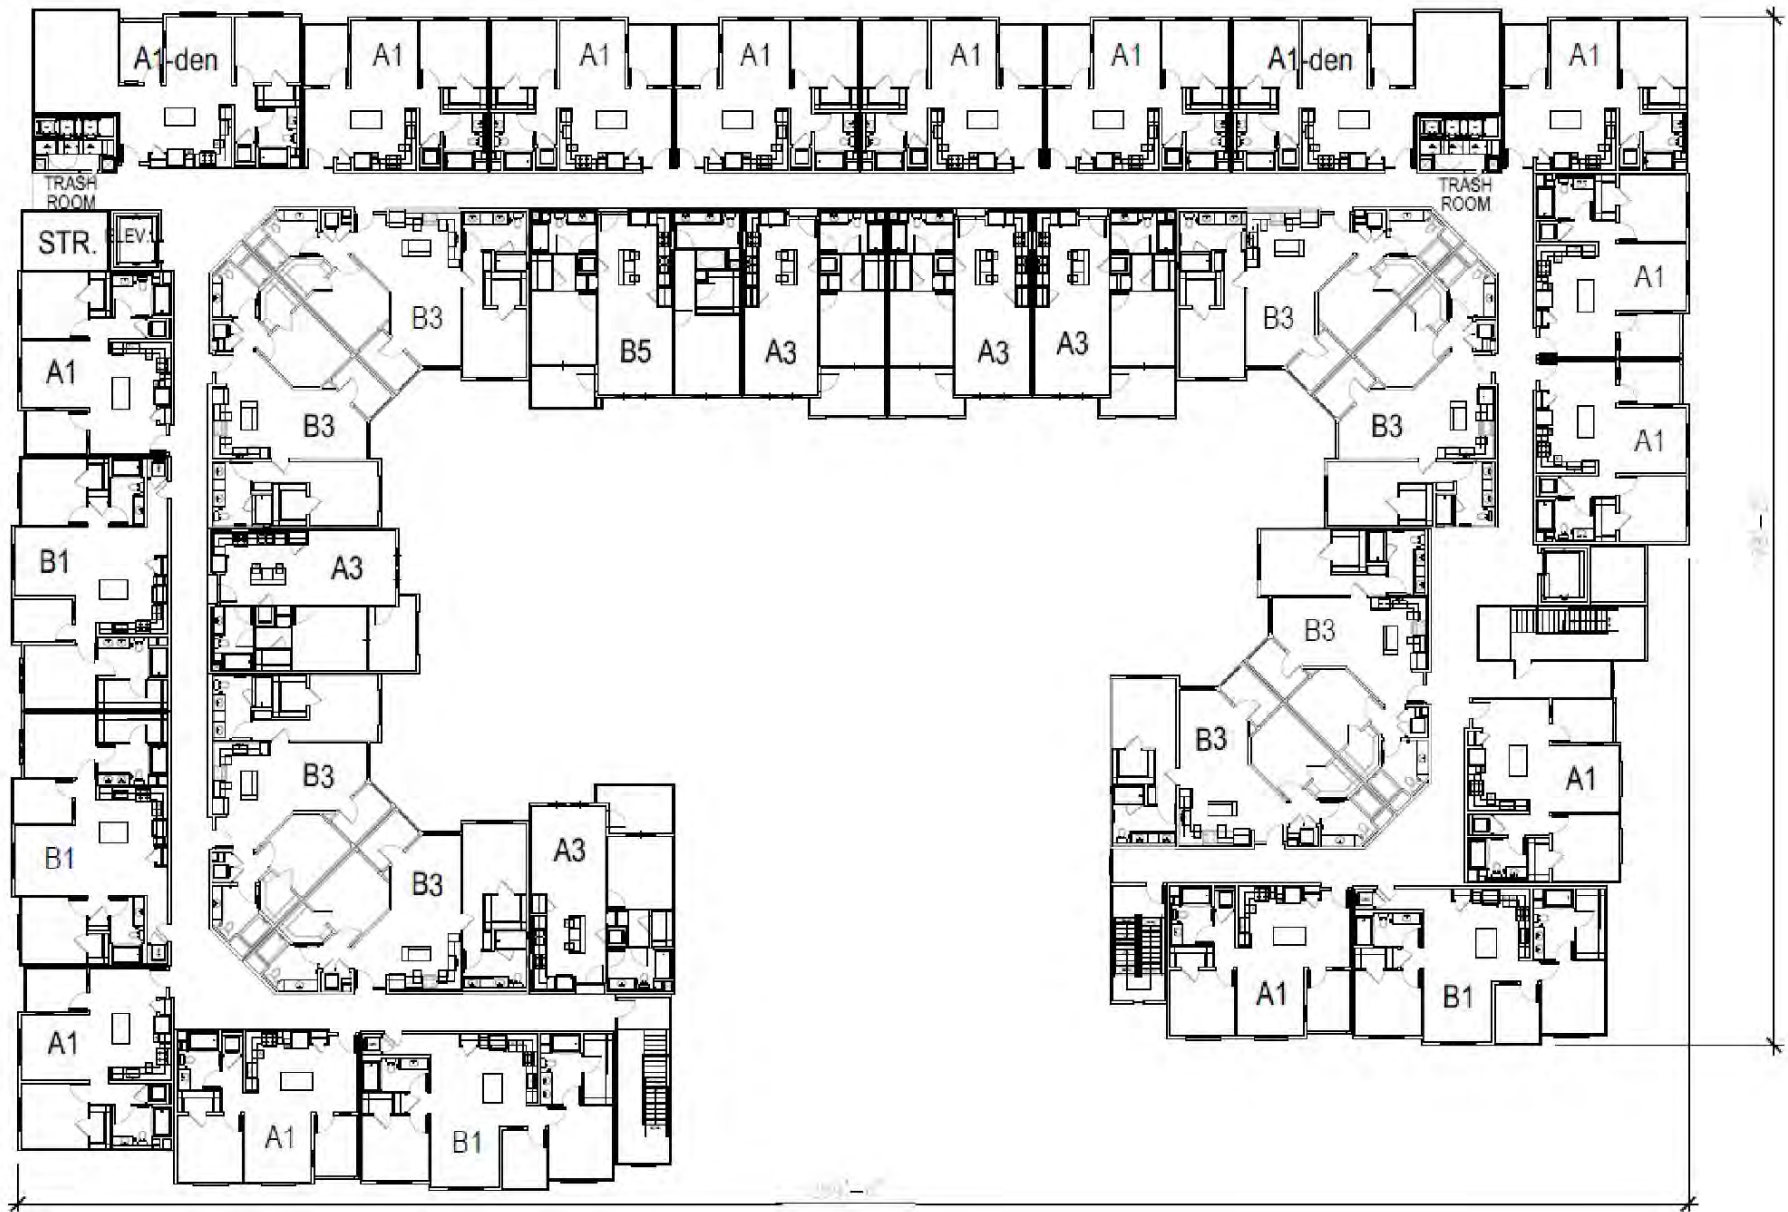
Type D Building 9 - 3rd Floor Plan
